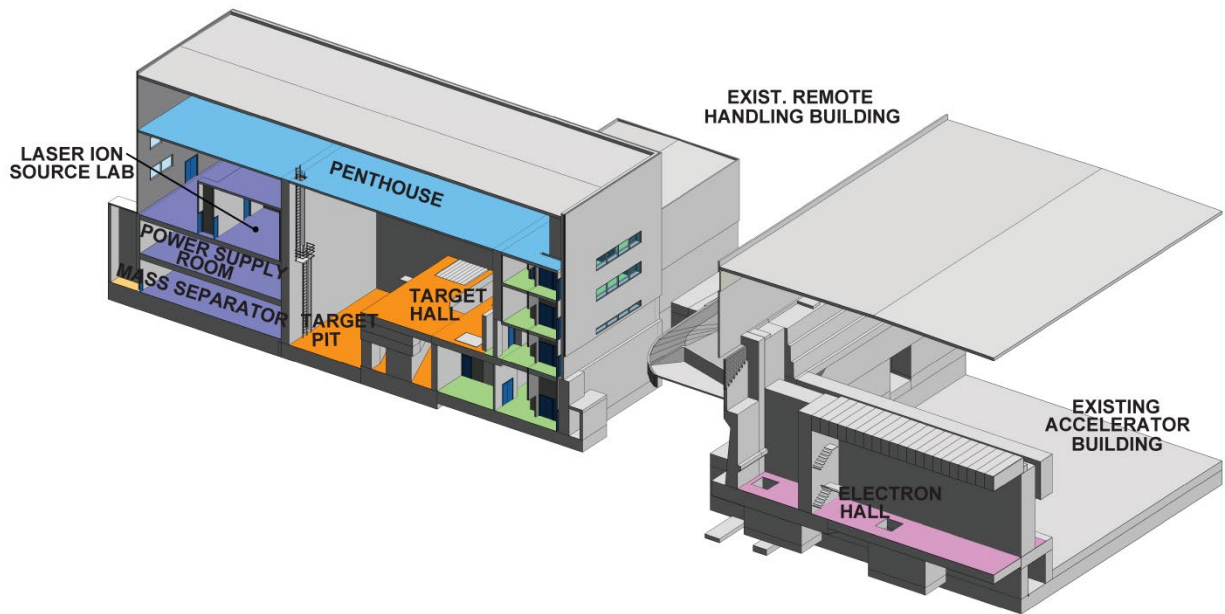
Architectural plan showing a section through the ARIEL building as well as the Electron Hall
